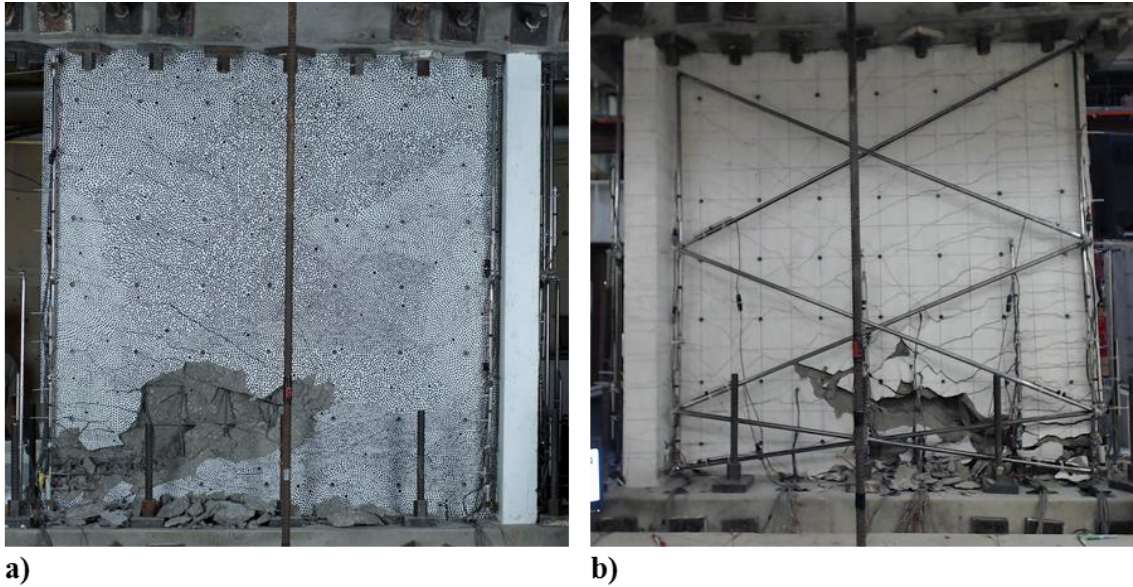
Specimen WP4 – a) Photo of front (south) face of specimen after test; and b) Photo of rear (north) face of specimen after test
